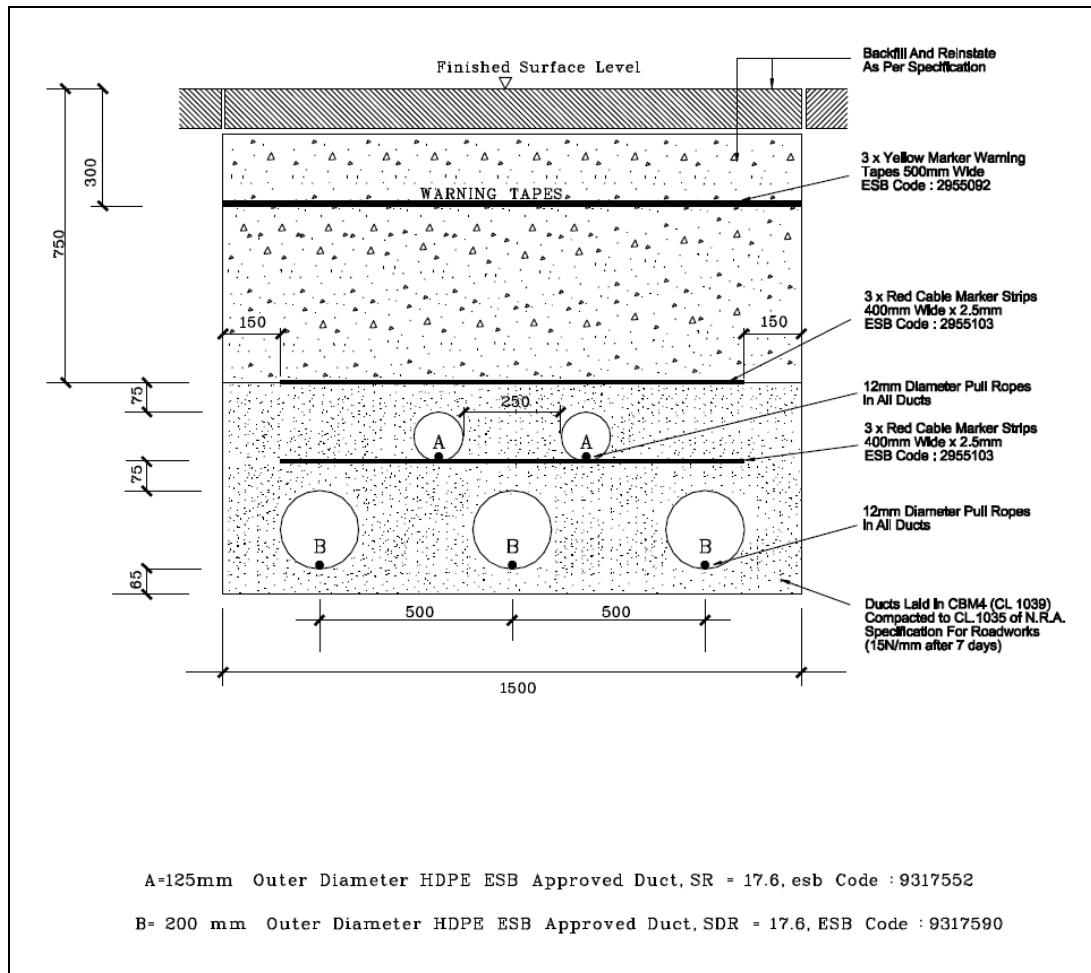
Cross Section of 400 kV Single Circuit Underground Cable
